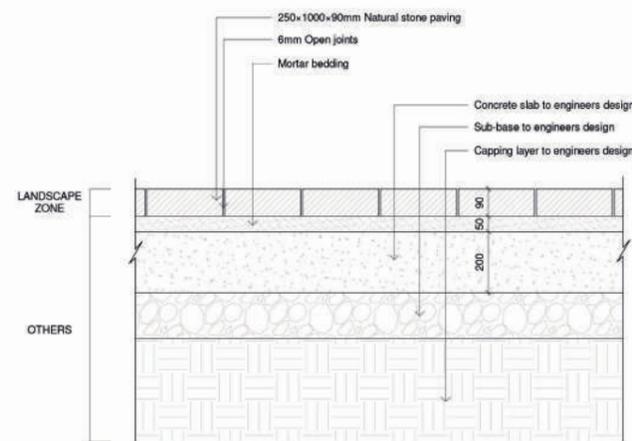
COURTYARD STONE PAVING TYPICAL DETAIL
